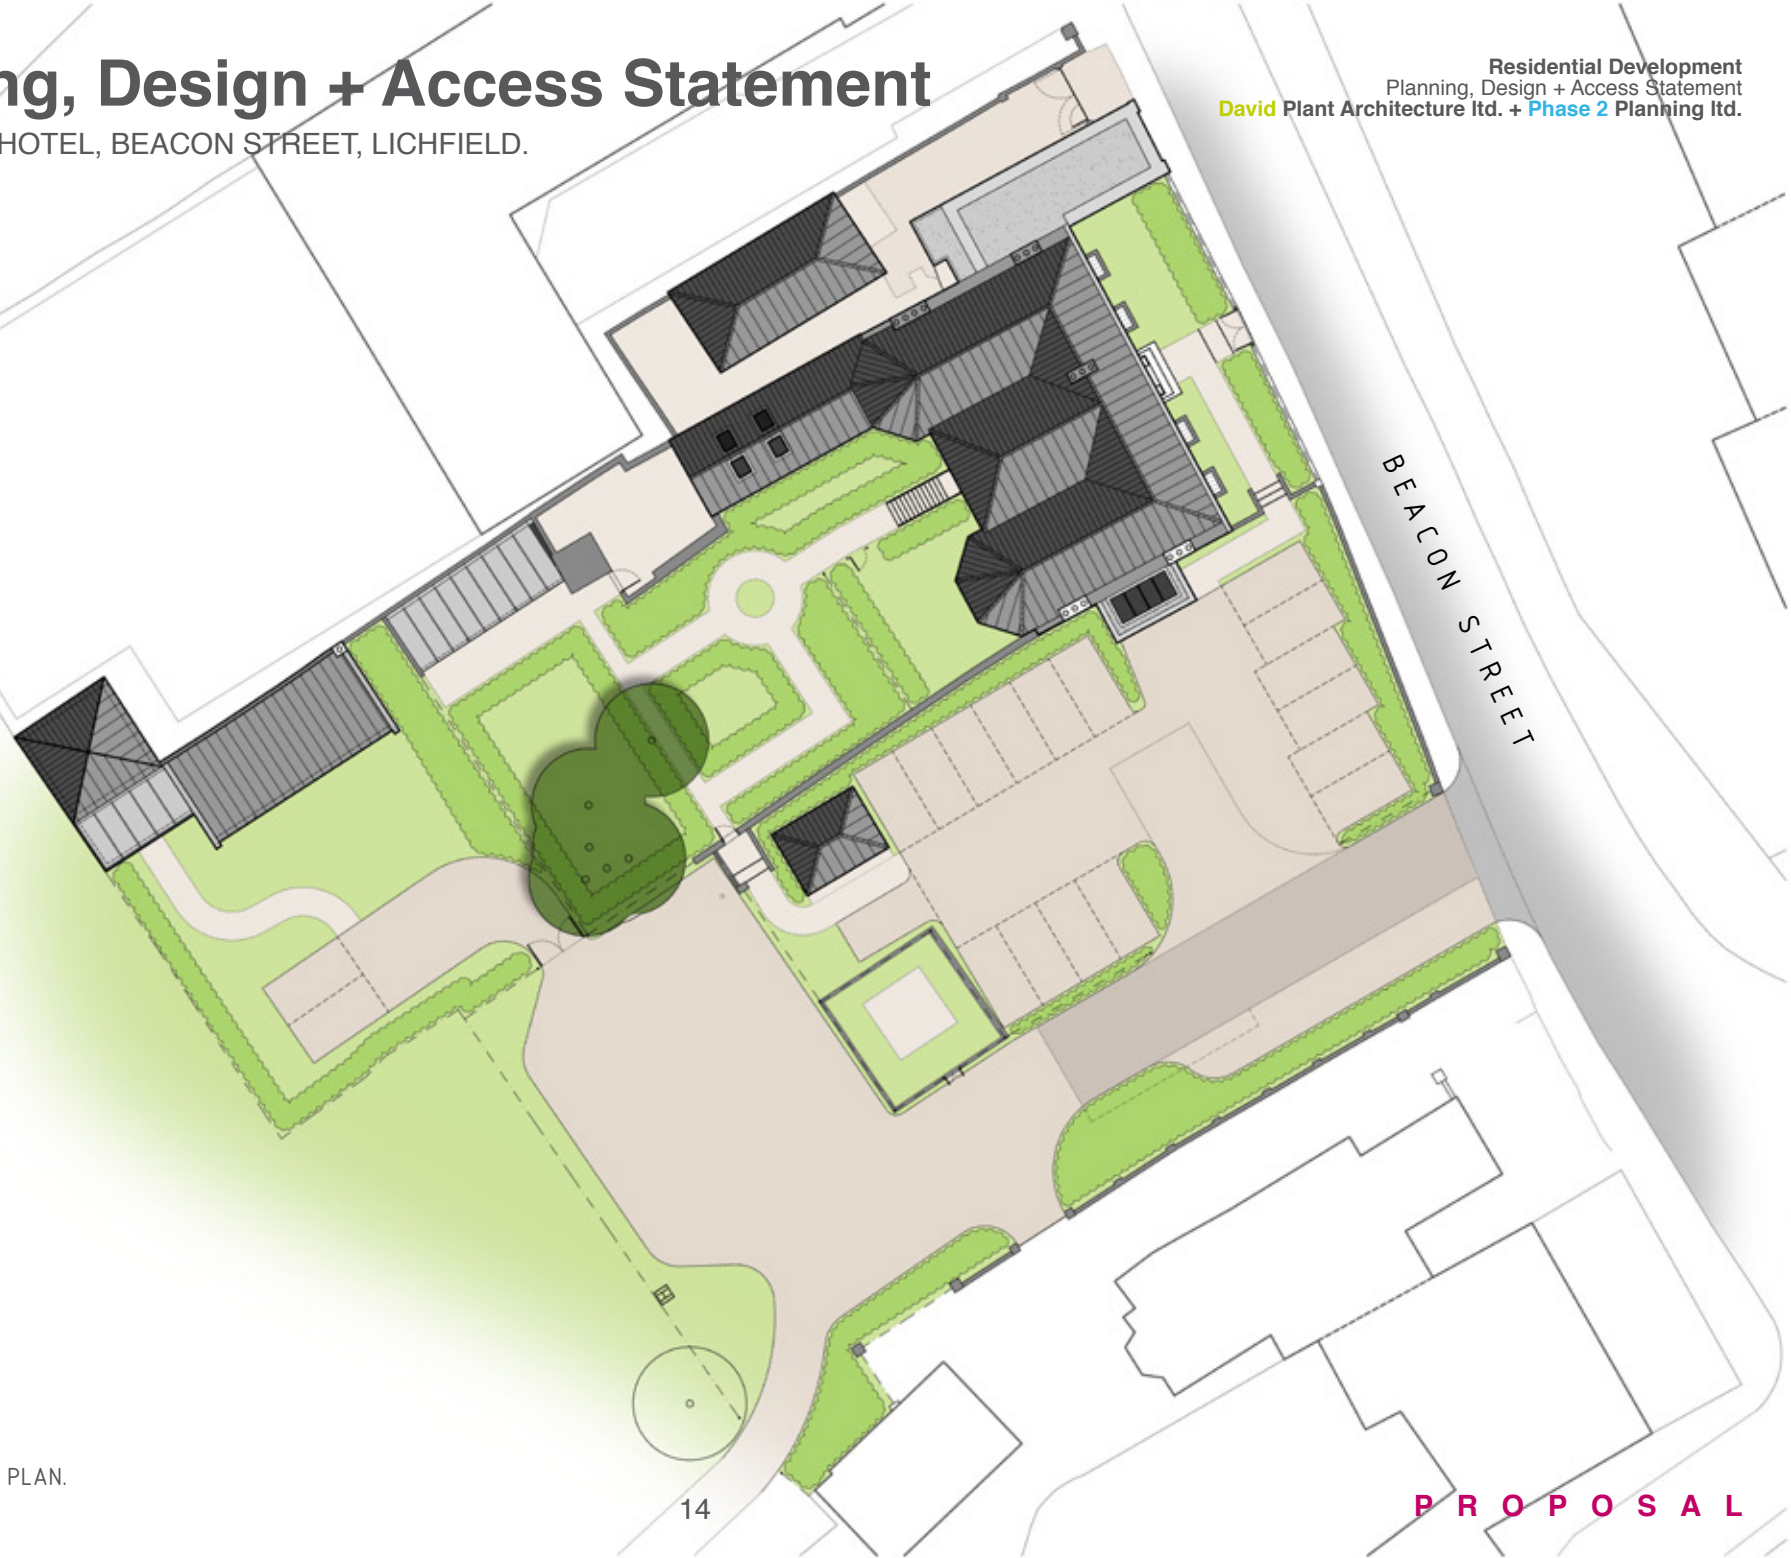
PROPOSED SITE LAYOUT PLAN.
